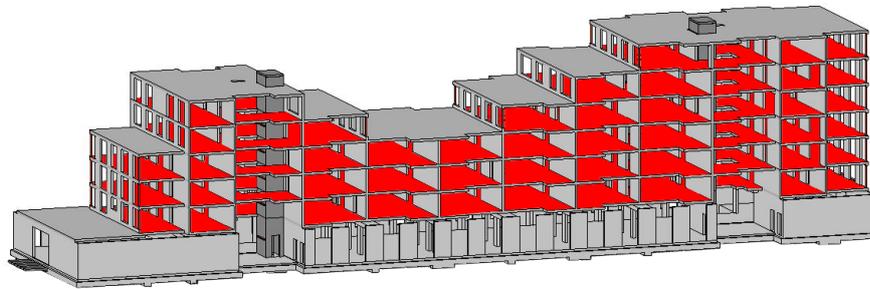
Concrete Floors Changed to CLT Floors in Design Variant 1
